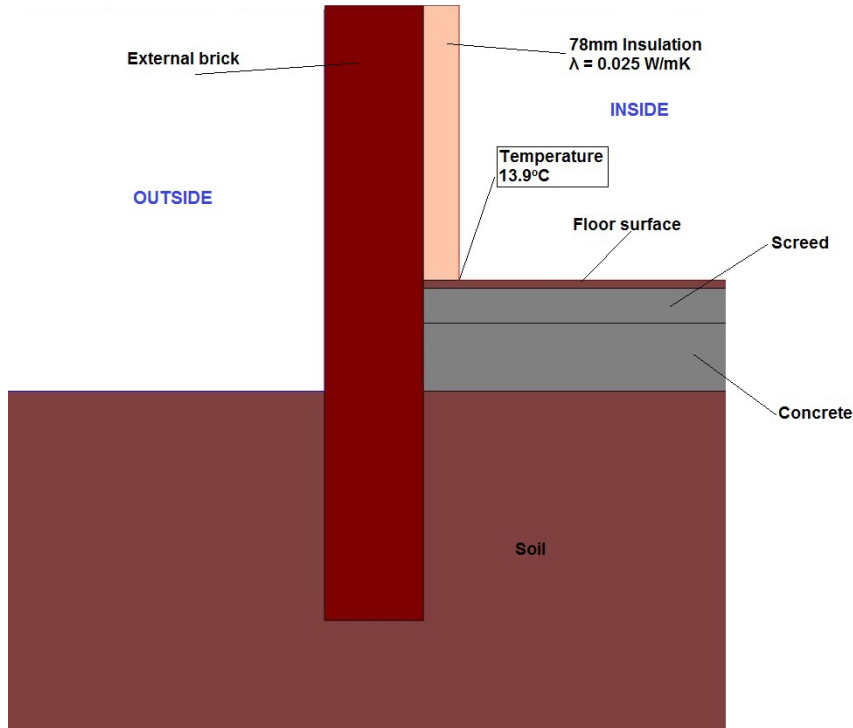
Junction between an uninsulated concrete ground floor and a wall insulated internally (typology R8) with no junction insulation
